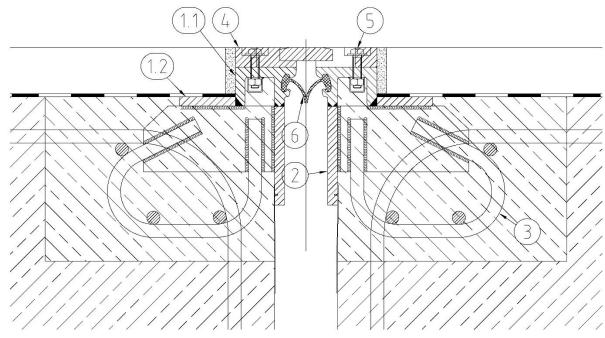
Exemplary cross section of the nosing expansion joint Fahrbahnübergangskonstruktion Typ SP/FP-NR, including anchor loop, pavement thickness 75 mm
